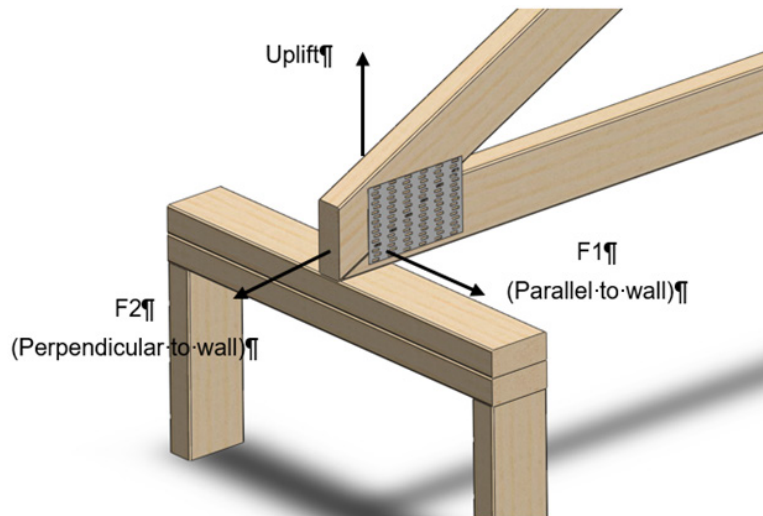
Truss/Rafter/Joist to Double top Plate - Uplift and Lateral Load (F1 and F2) Directions
